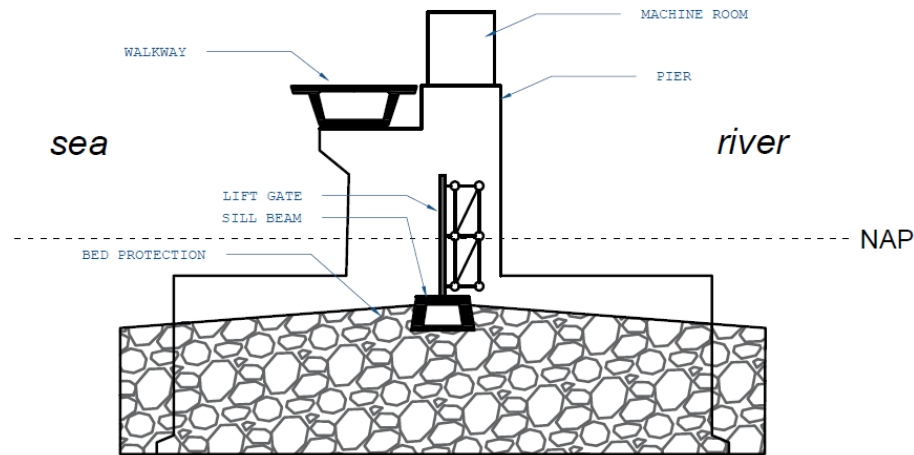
Sketch of an example layout for a lift-gate configuration of the gated barrier section
